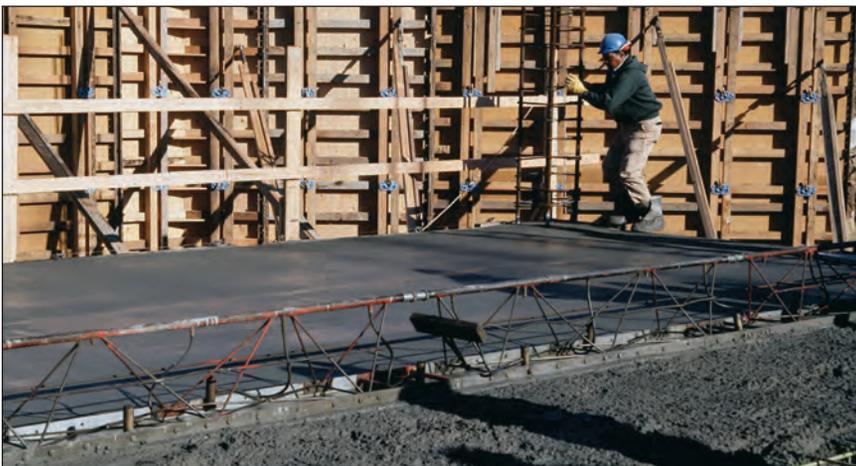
B. Consolidating silica-fume concrete using a vibrating truss screed.
